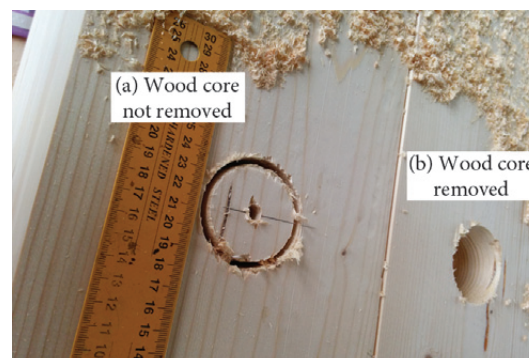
Sample preparation with a wood core (a) and concrete in-fill core (b)
